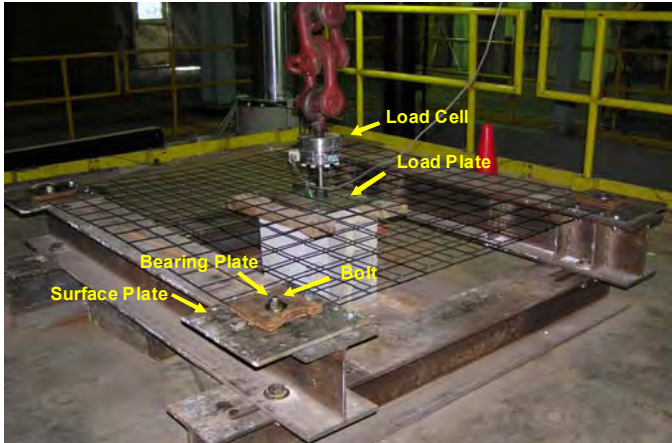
Test frame set up used to test the welded wire screen. Bolt spacing is 48 x 48-in.
